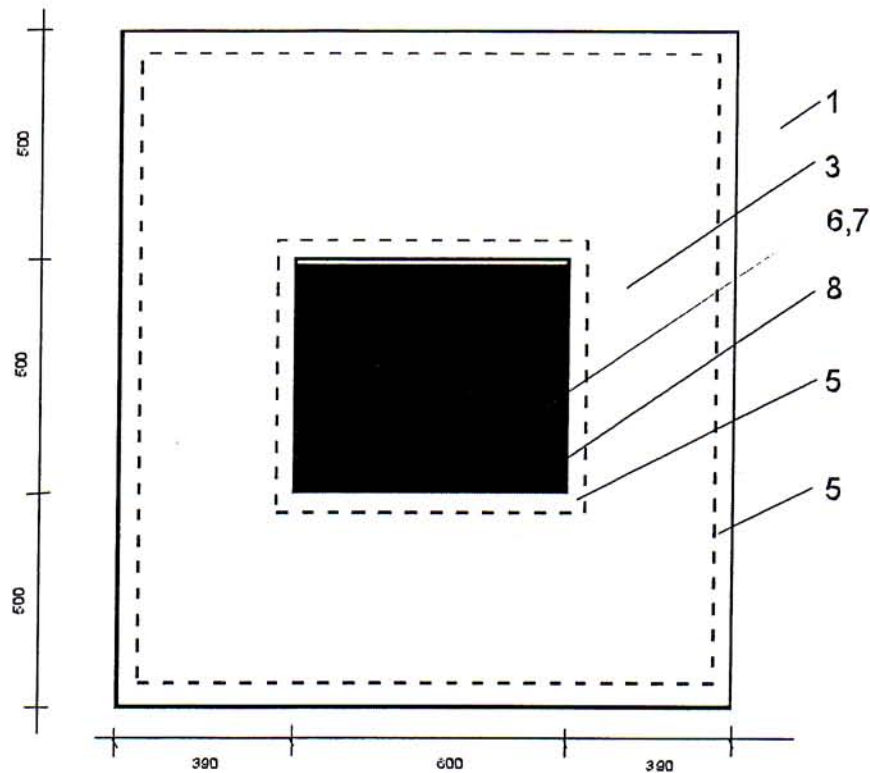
Horizontal cross-sectional view of test object and connection to test bench opening
